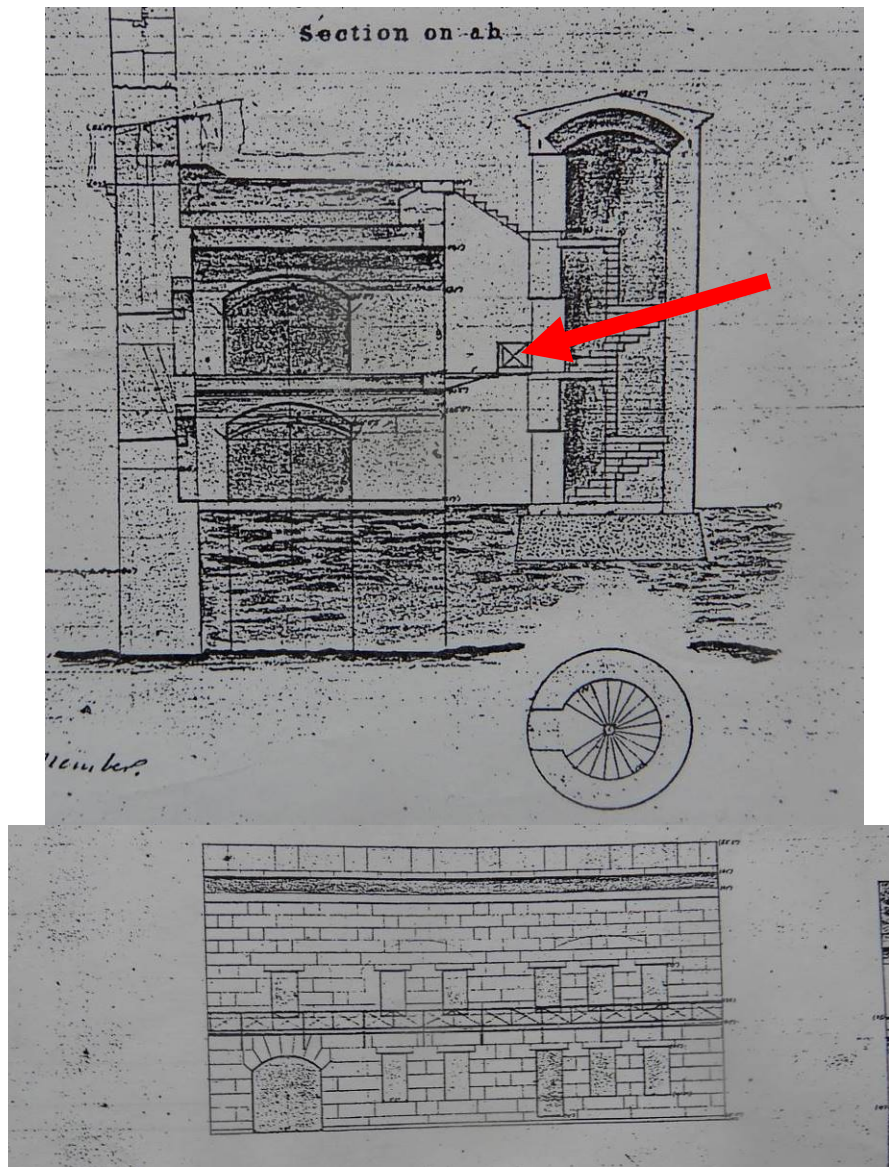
Iron bridge suggested on design drawings (arrow). Note also that the tower was originally conceived to be a cylindrical structure, and that the finished Barbette Tier elevation was to be several feet higher! Early design drawings also show three towers, located at the centers of faces I, III, and IV. It appears that the later addition of the massive powder magazine inboard of Face I required the reduction to two towers. Further research is necessary to determine if any evidence exists of towers at different locations.
